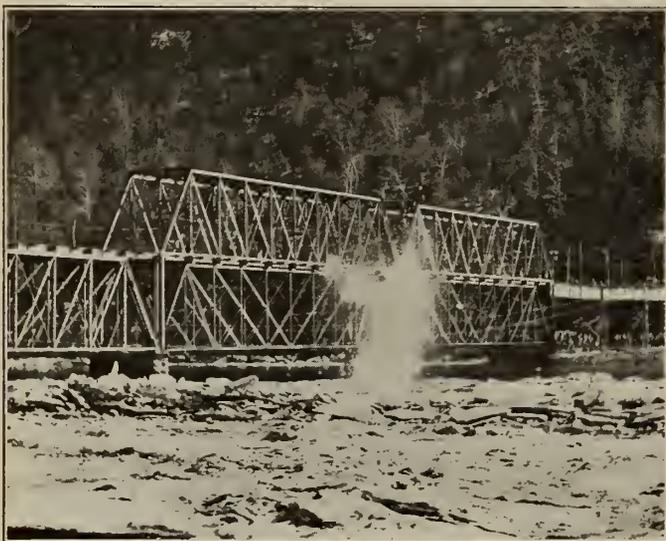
A Thermit Heat Unit fired at Big Rock Bridge.
